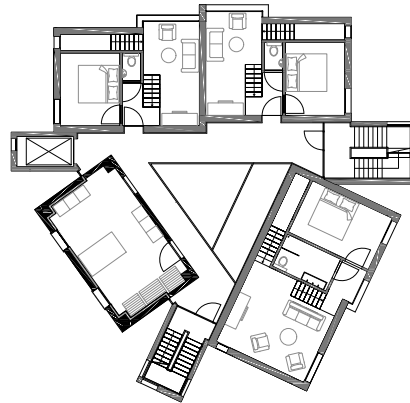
Second floor, scaled to fit - laundry, type C apartment, type B apartments
